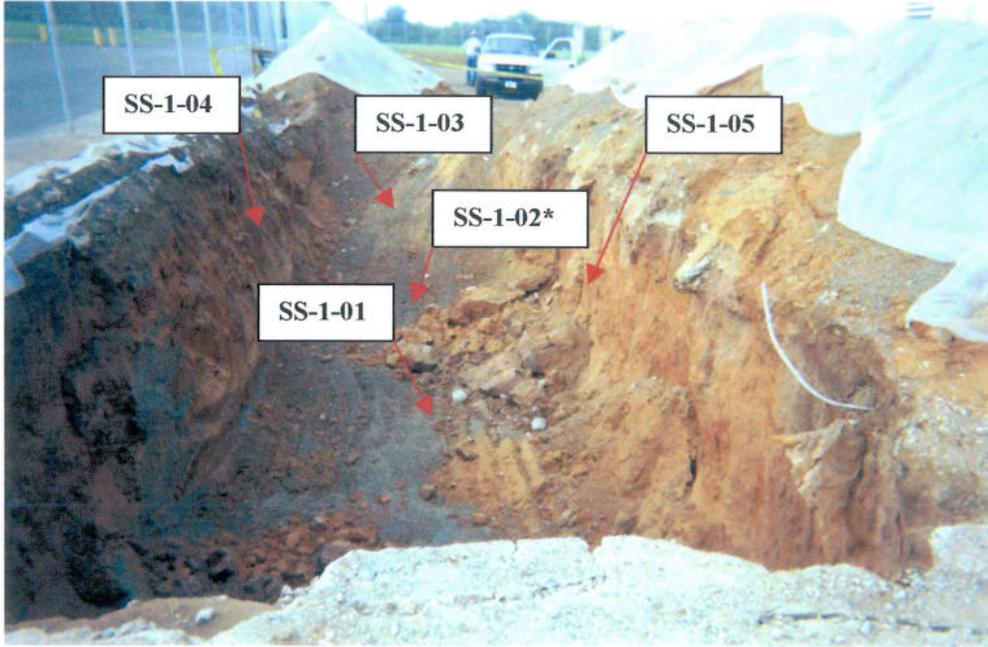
Sample locations for Diesel tank. View is southwest of Building 2015.
